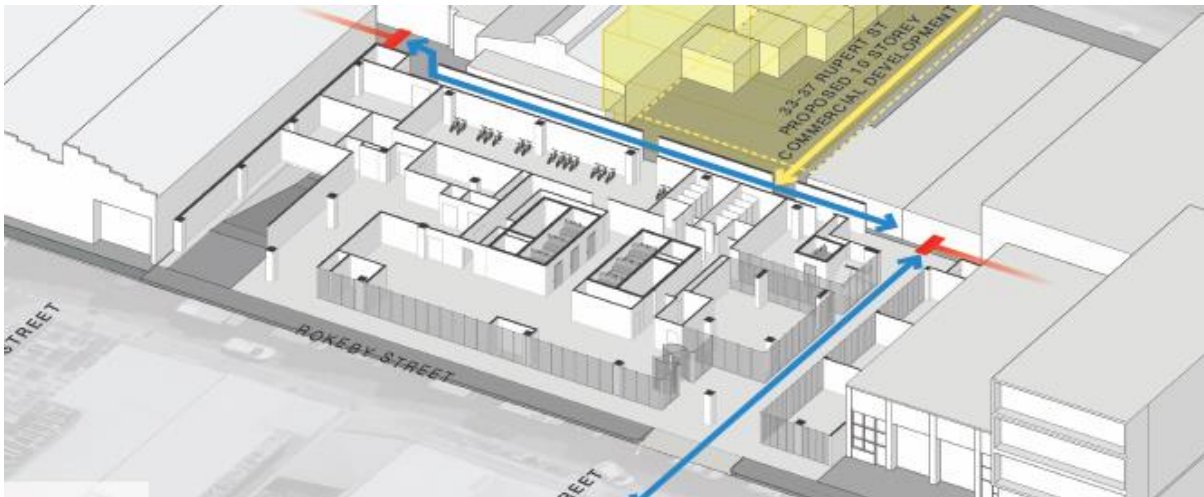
Ground floor plans with publically accessible line of travel delineated in blue, terminating laneway indicated in red and upper levels cut-out with 3d imagery of internal wall.
